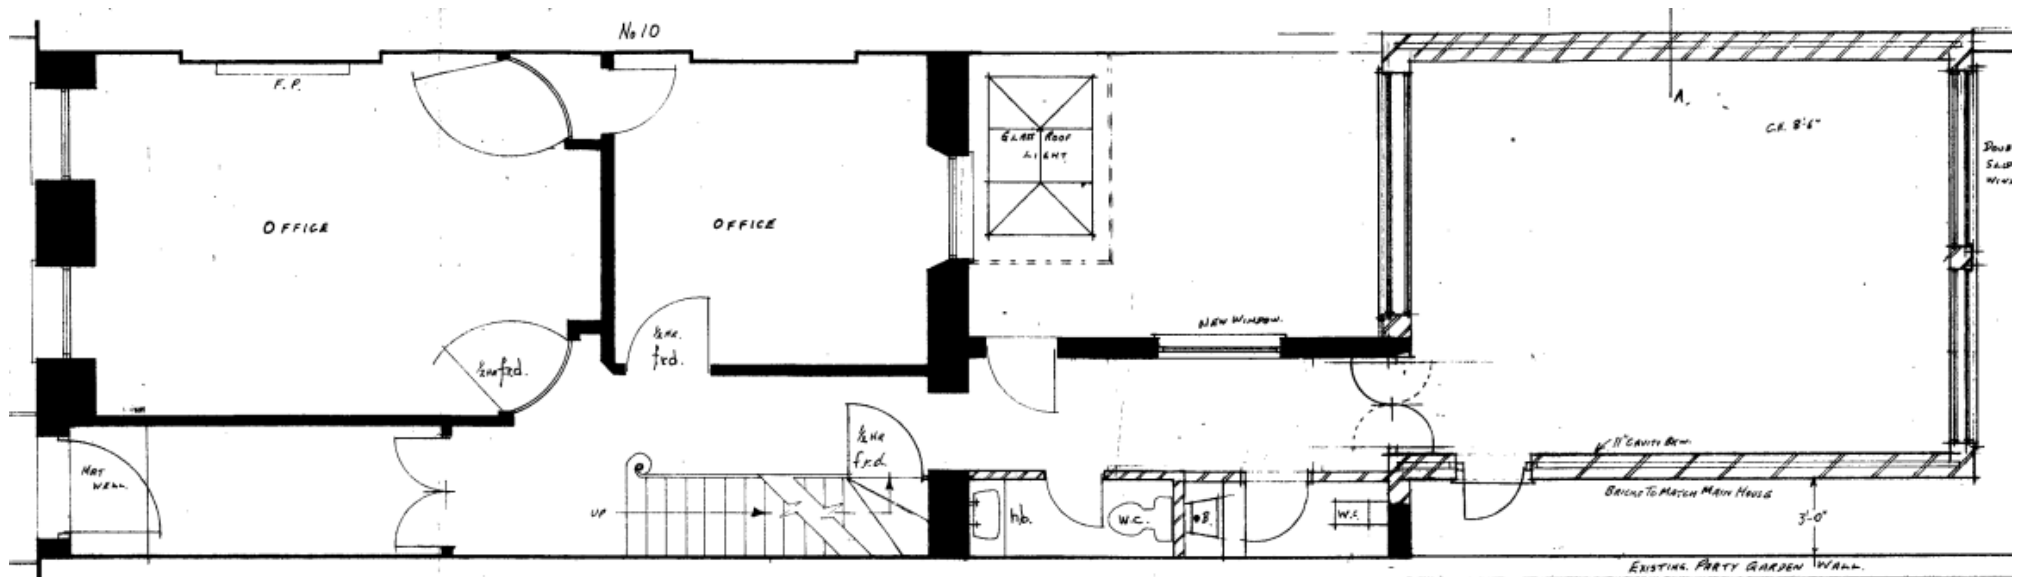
1969 Ground floor consented plan (ref: 7893(R)) showing the extension that was constructed.
